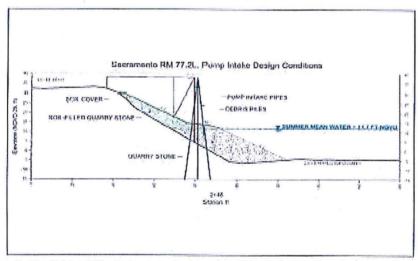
Design conditions cross section at SAC RM 77.2L at the pump structure location.
